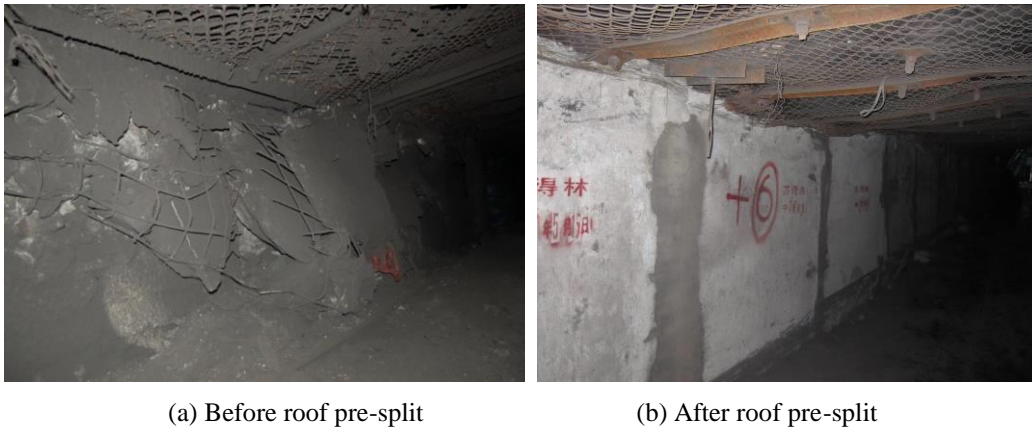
Profile of the RGSG under hard roof before and after roof pre-split application
